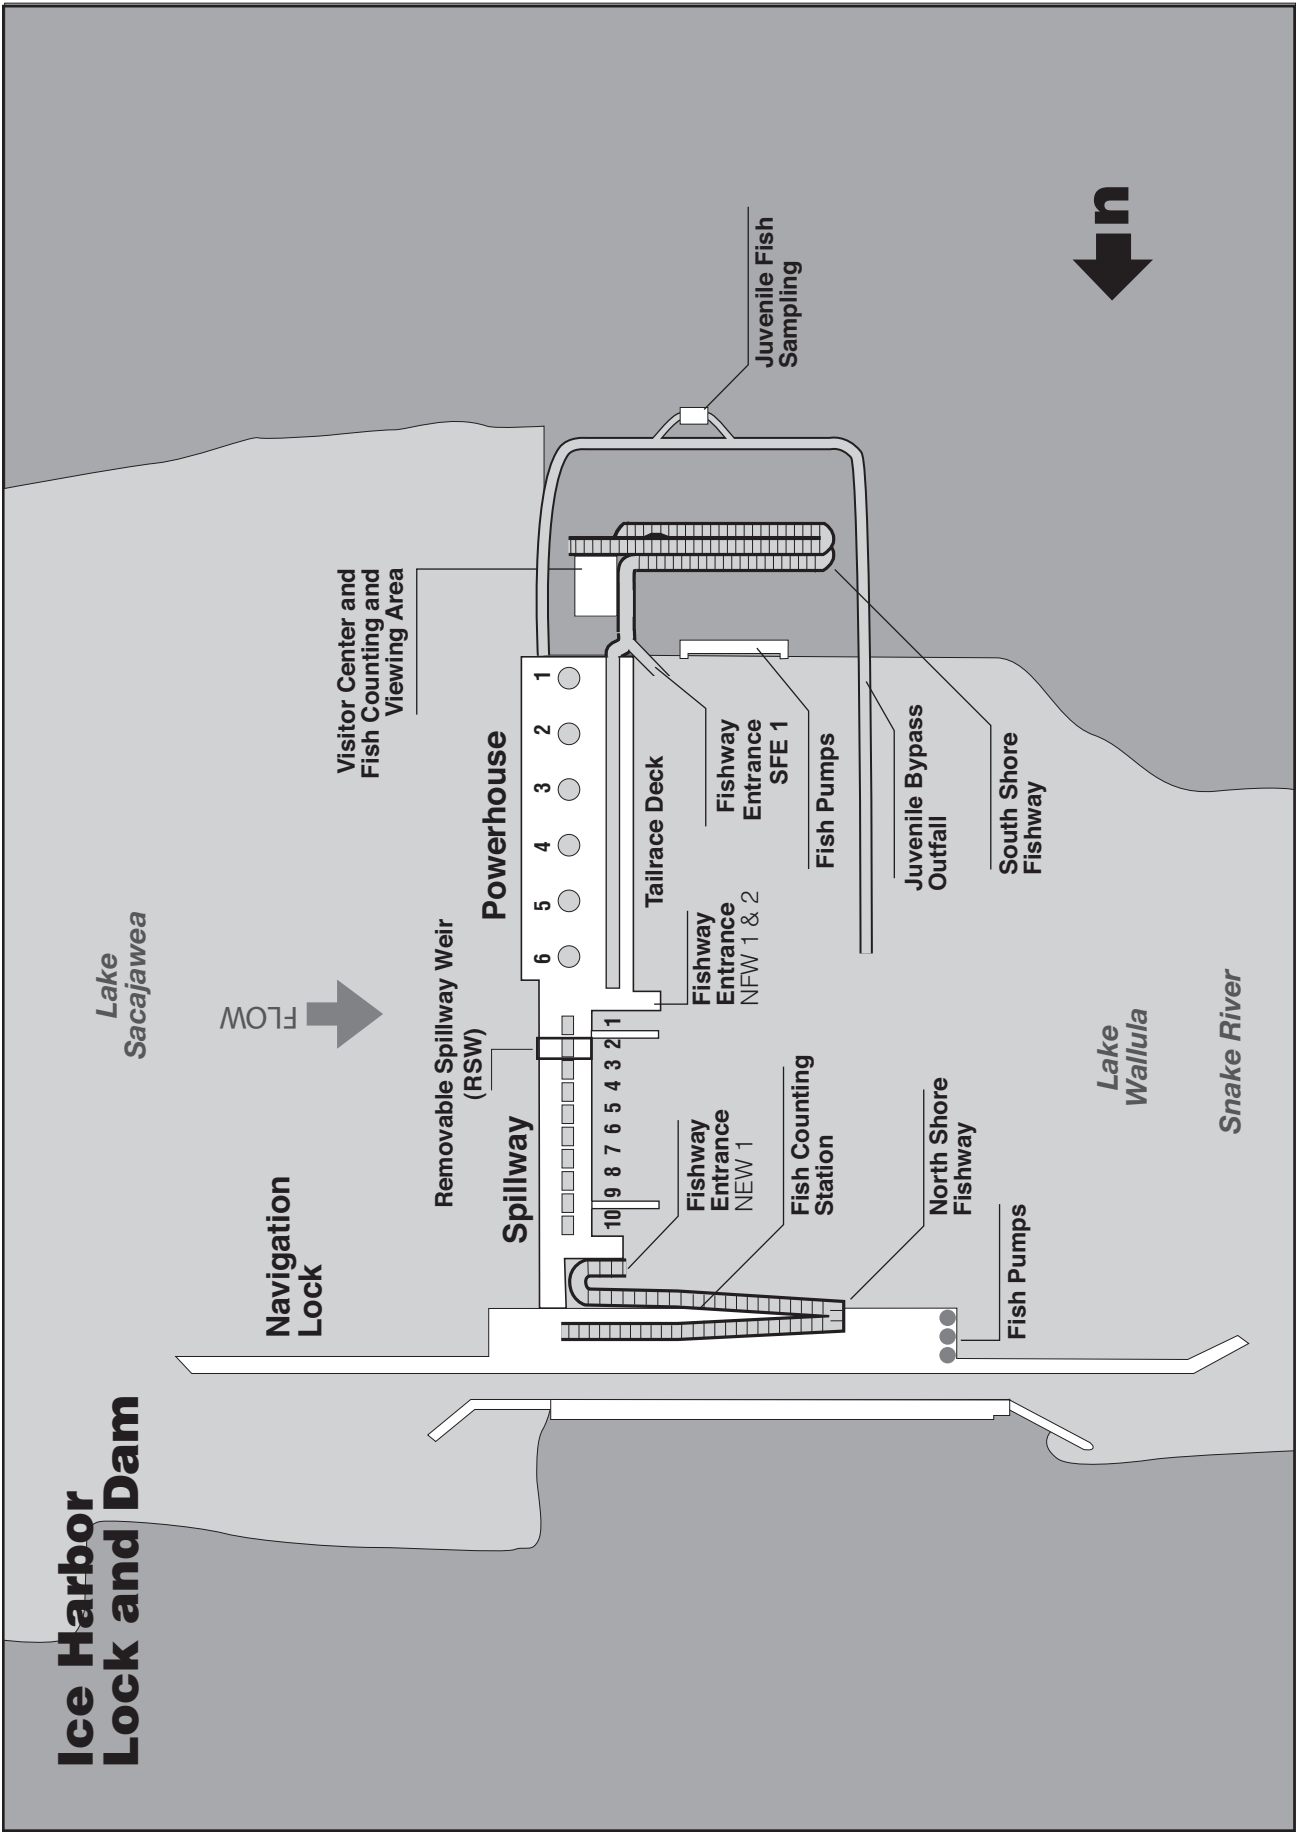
Ice Harbor Lock and Dam General Site Plan
